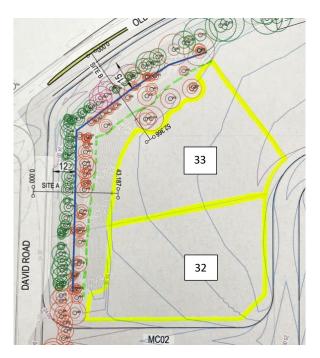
Recommended Retaining Wall location on Sections from mound retention plan. Blue is as proposed by the Applicant & Red is approximate as envisaged deferred commencement condition (subject to further arboricultural assessment and engineering detail)
